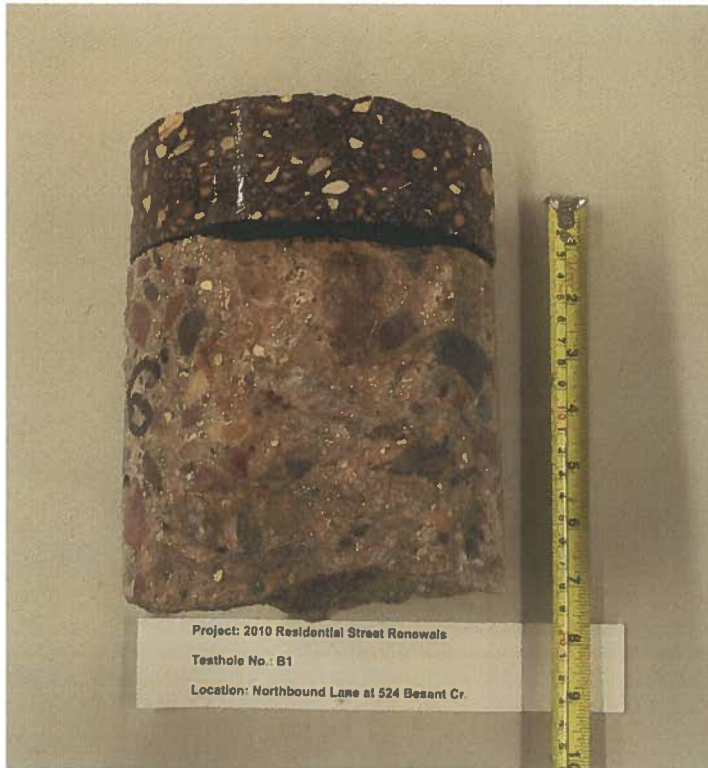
Test Hole B1: 524 Besant Cres., Northbound Lane, 10 m S of S sidewalk at Munroe, 1.9m W of E curb
